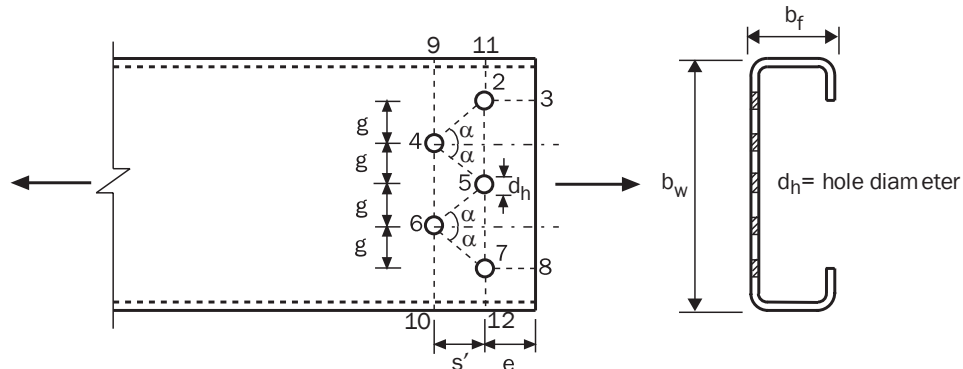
Potential Failure Paths of Stiffened Channel (Tension or Block Shear Rupture)
